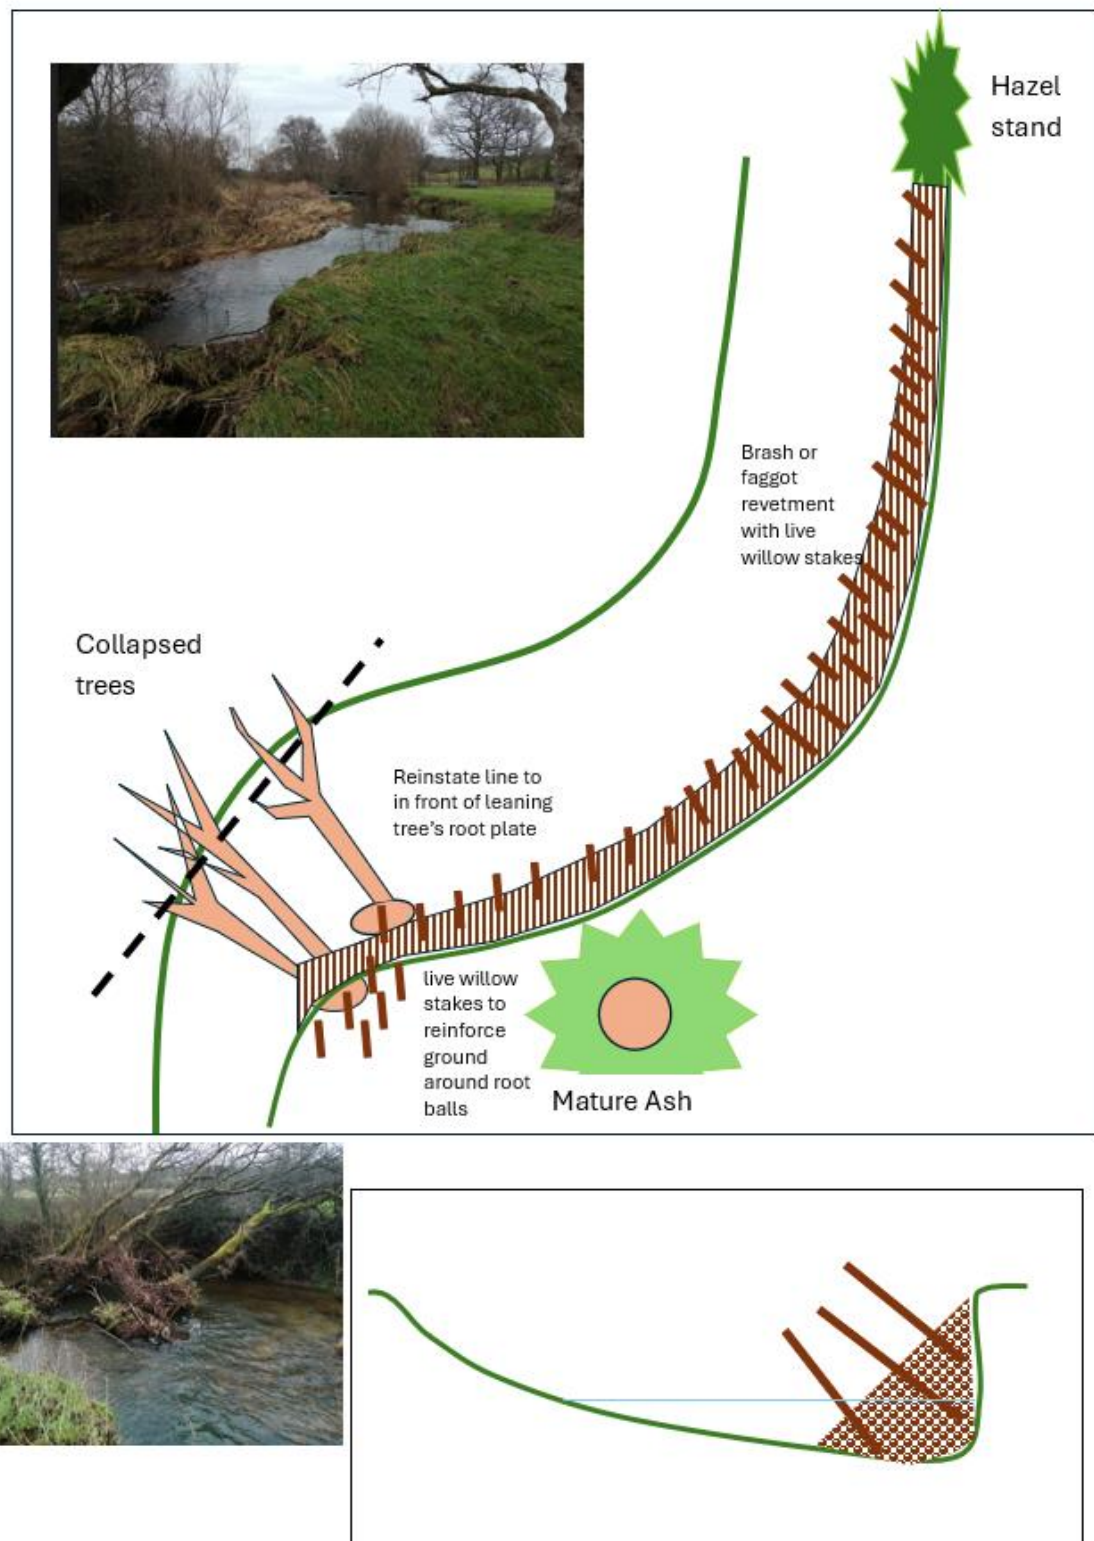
Detailed Design Drawing showing brash wood or faggots design. Cross Section showing willow stakes, staked into the bank holding revetment in place.
